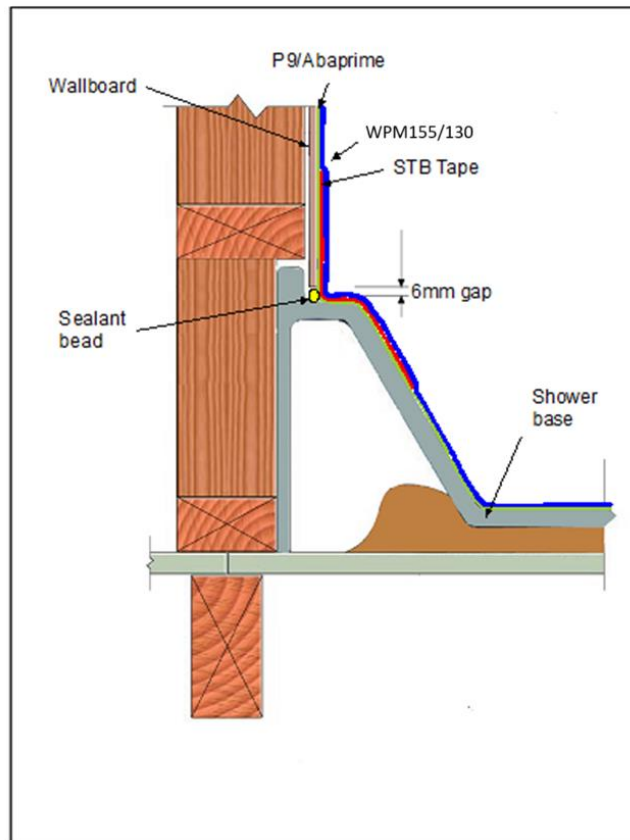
An example of a wall tray detail where fibre-cement sheets are placed onto a pre-formed shower base. Note STB tape over the sealant filled joint.
